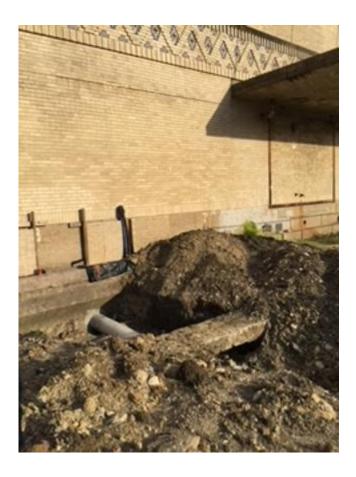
9.4.19 -- Start Limestone Cap Joint Sealing on North (Lancaster) Side -- Day After Rain
